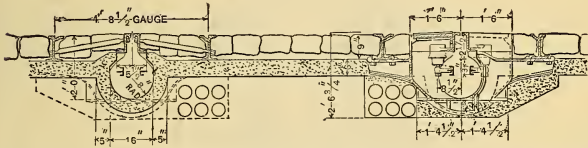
Section of Conduit, Metropolitan Street Railway, New York. — Standard Work, 1897-98.
